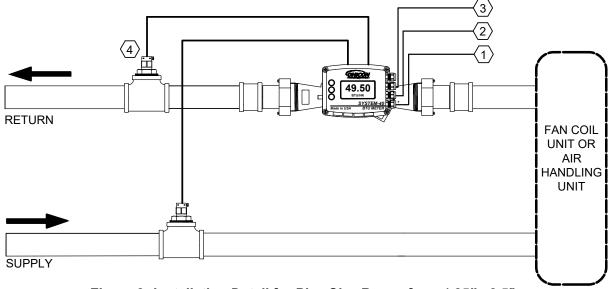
Installation Detail for Pipe Size Range from 1.25" - 2.5"
